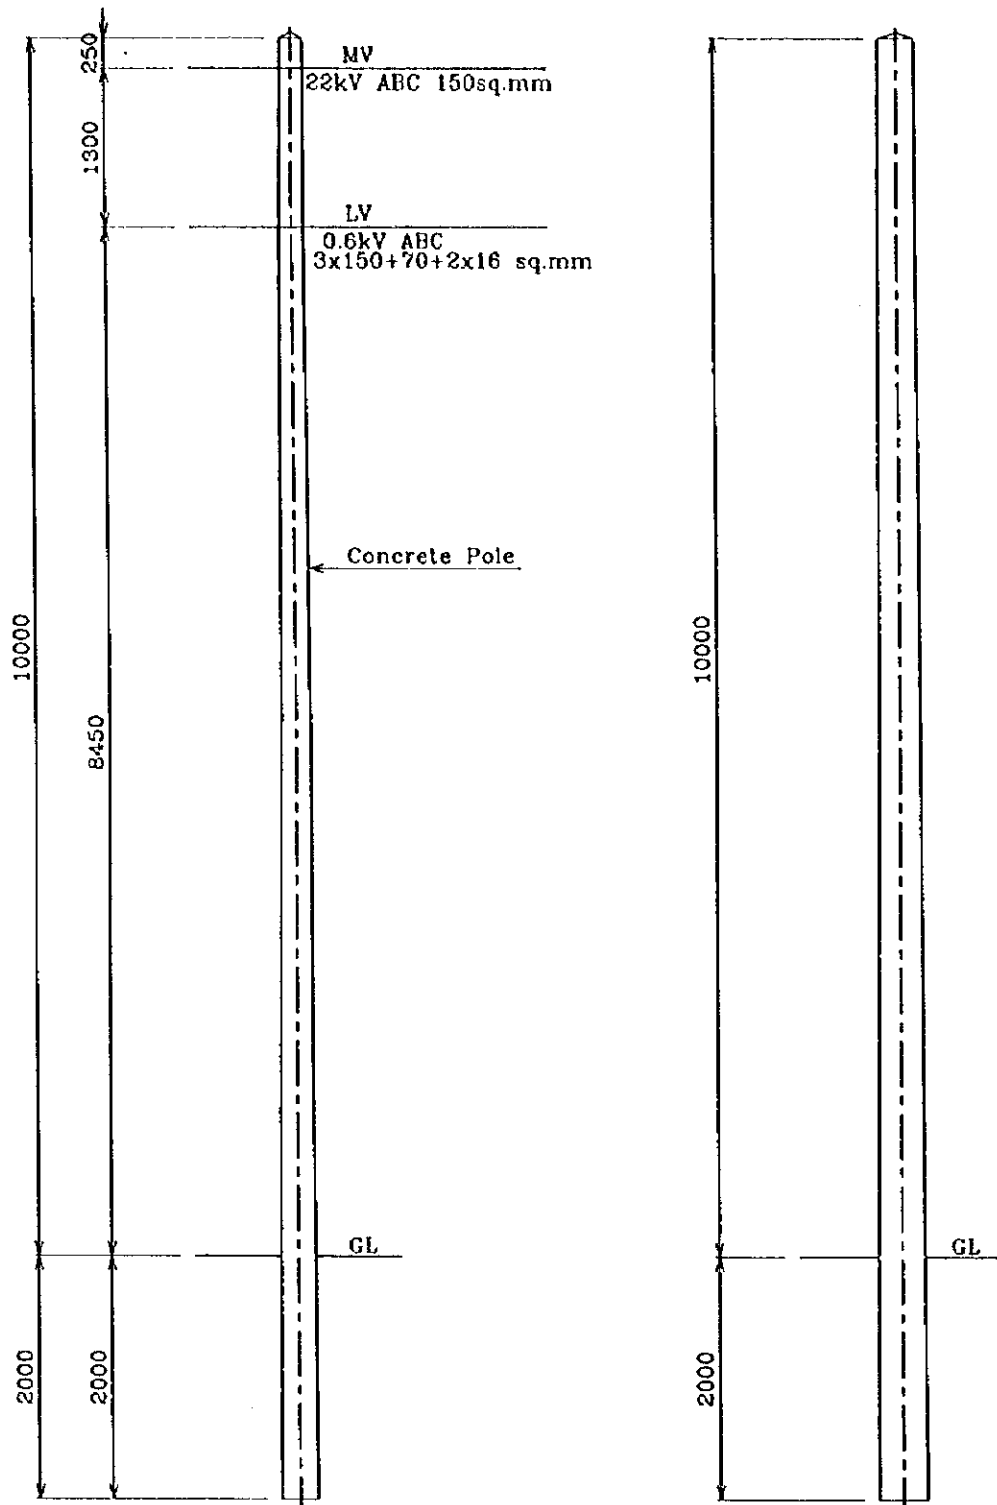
(1) MV and LV Aerial Bundle Cables Arrangement on Pole
